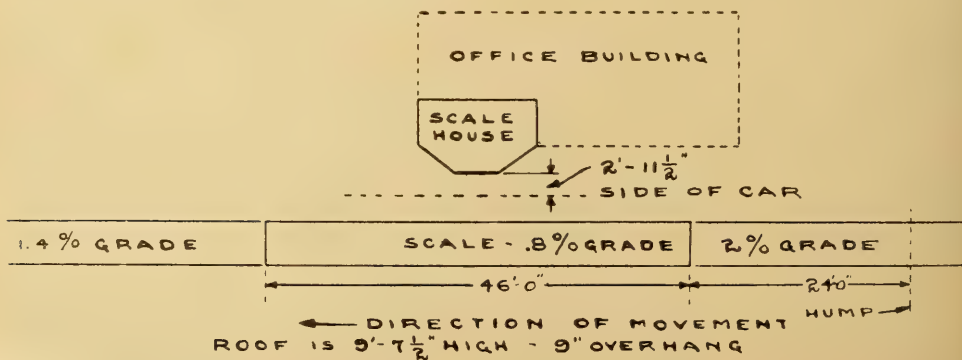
FIG. I.—TYPICAL TRACK SCALE LAYOUT.
